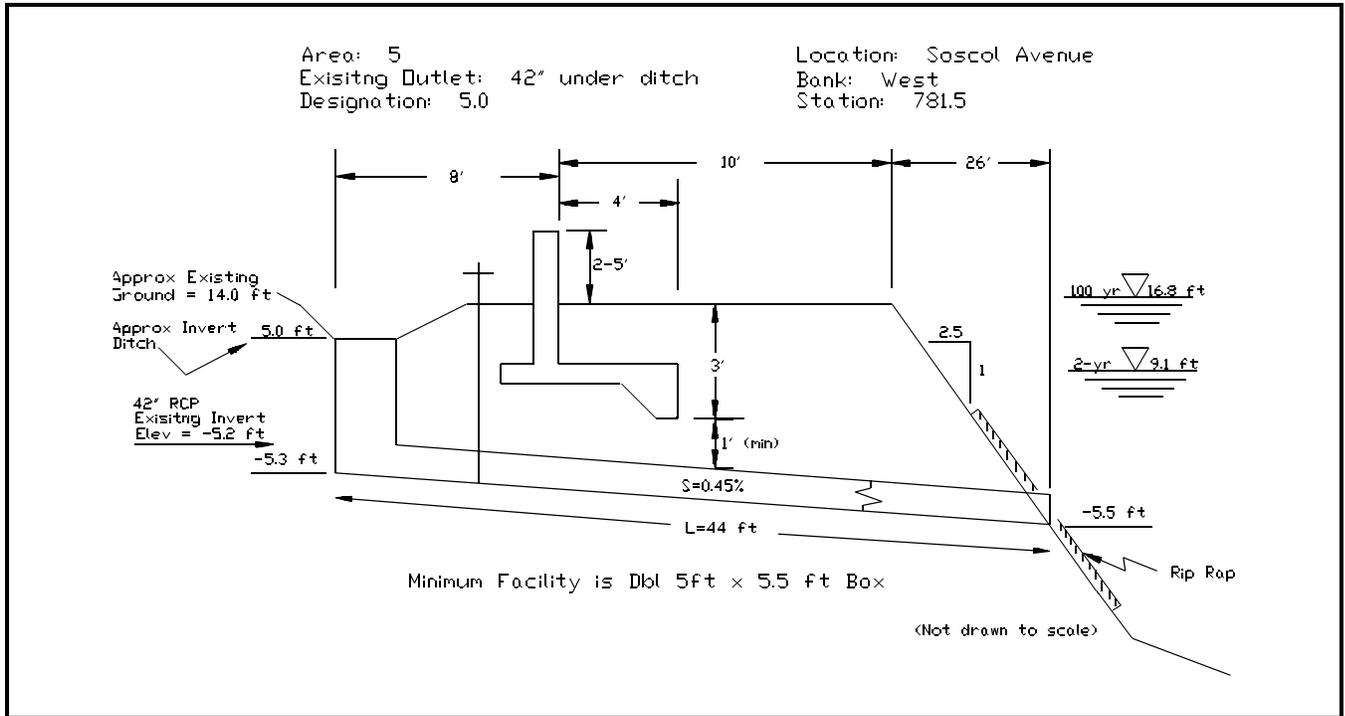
Typical layout - new box culvert with drop inlet Area 5
